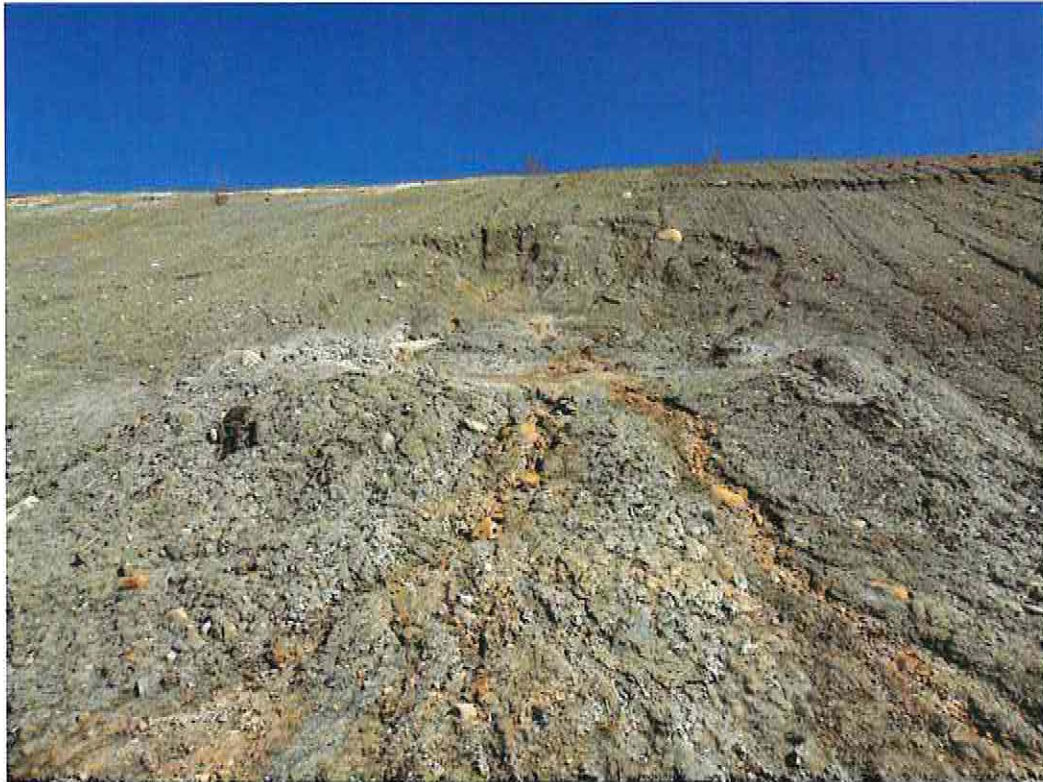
Shallow subsidence on till Dyke above seepage collection ditch
